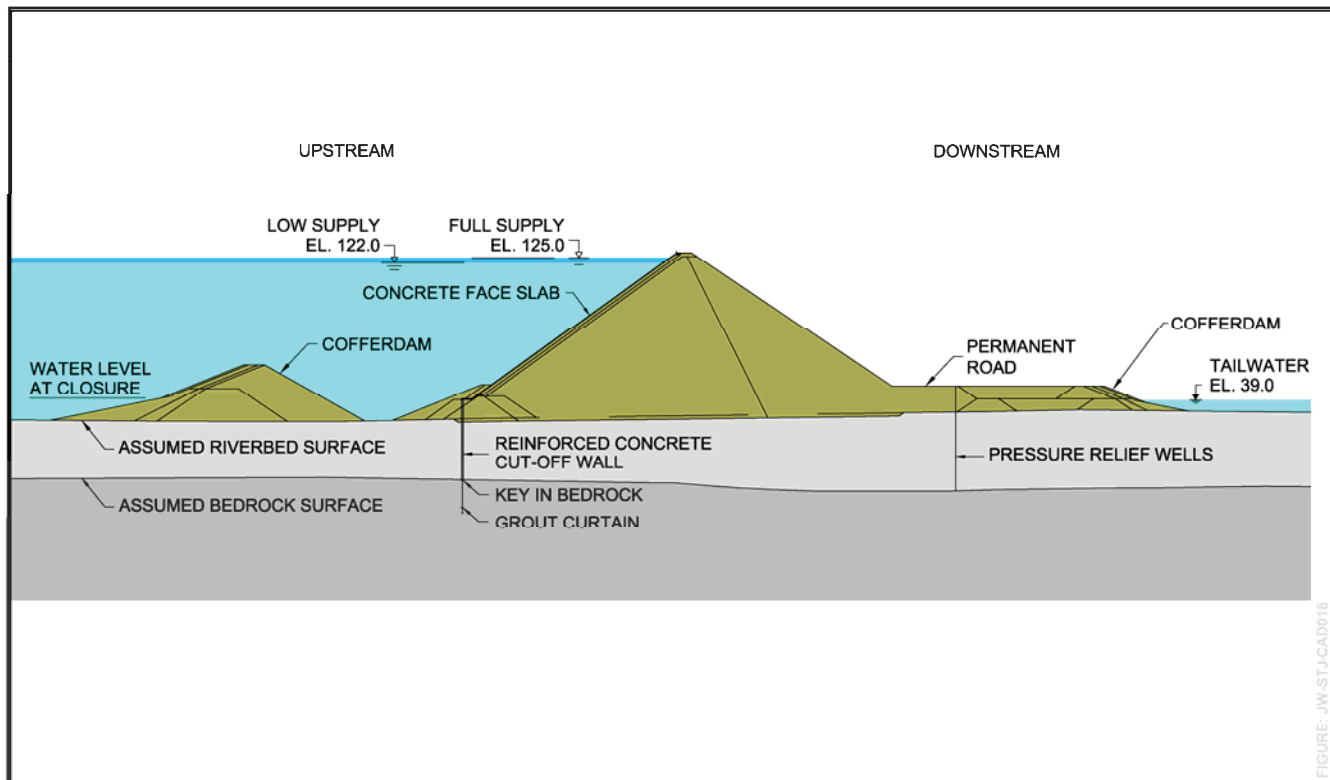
Cross-section of Gull Island Concrete Faced Rockfill Dam
